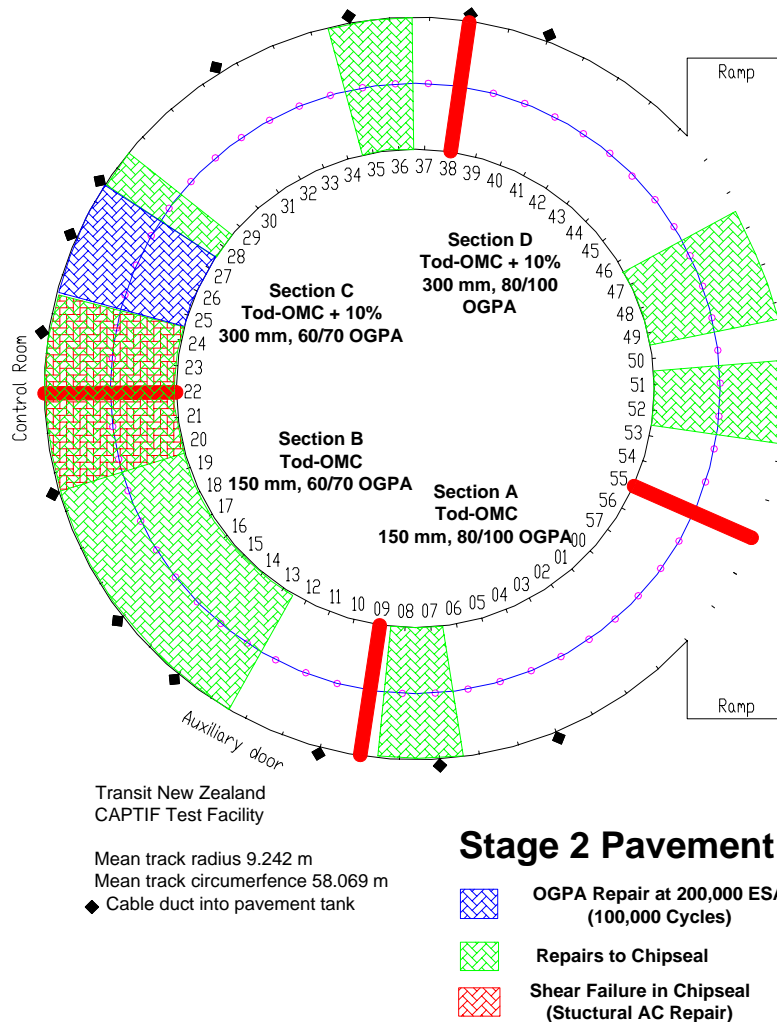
Pavement Test 2: positions of repair locations and when failures occurred.
